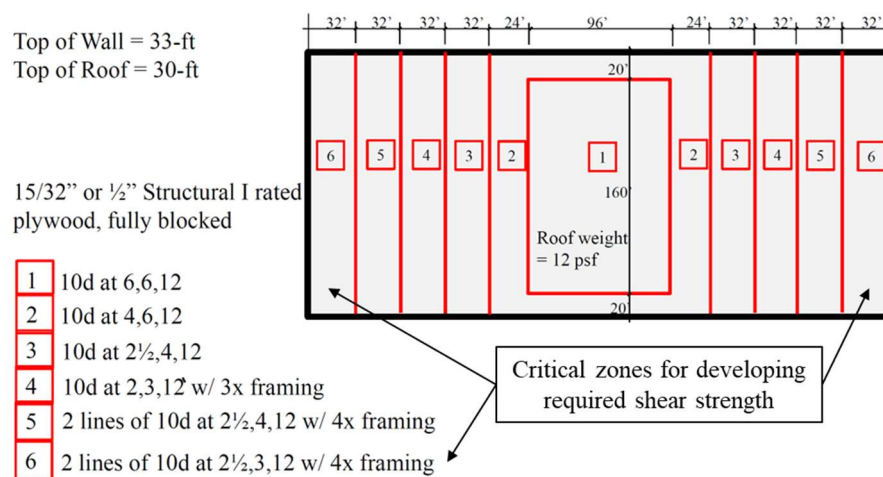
Example wood diaphragm design details for 400 feet by 200 feet plan and 30-foot wall height designed for $R = 4$, $S_{DS} = 1.0g$ and $S_{D1} = 0.6g$ (Figure adapted from FEMA, 2021)
